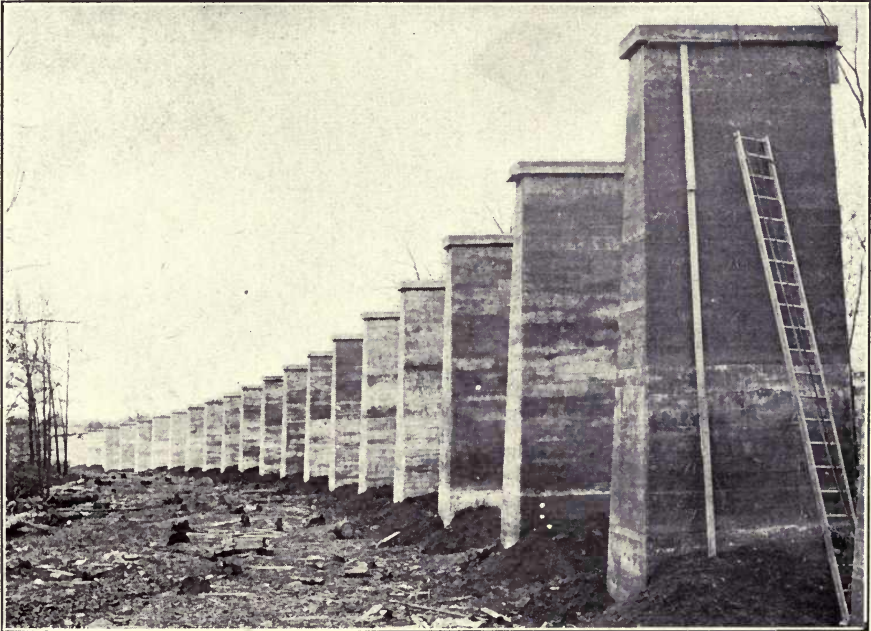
CONCRETE PIERS, PATERSON AND SUFFERN RY.
